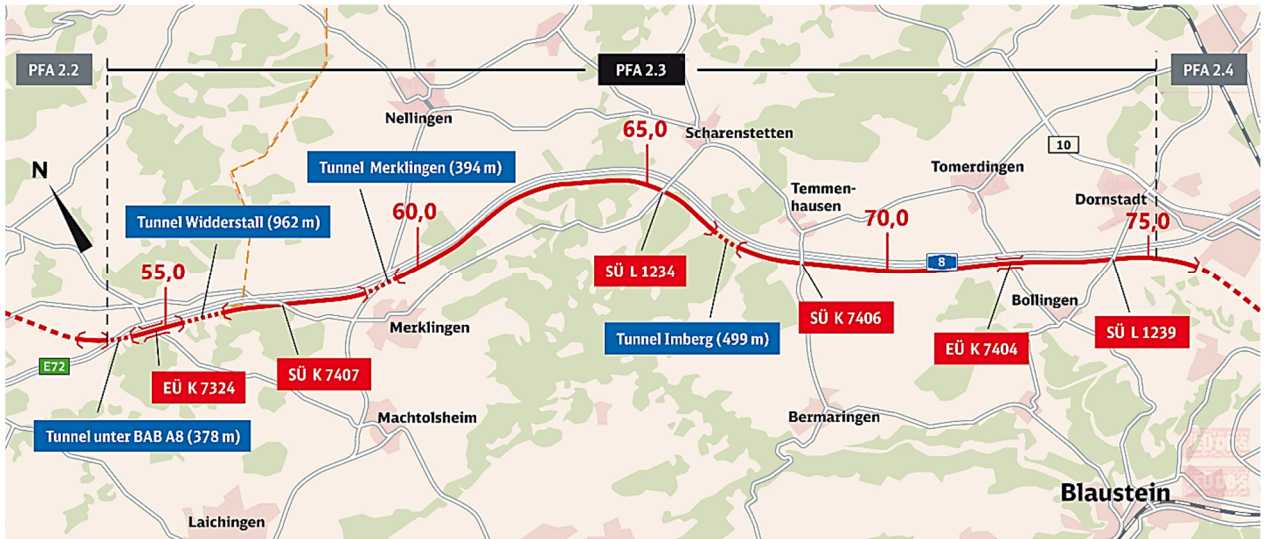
Overview of the PFA 2.3 Alb high plain with open air lines, tunnels, railway viaducts (EÜ) and road overpasses (SÜ) (in German, DB Projekt Stuttgart–Ulm GmbH © 2015).
